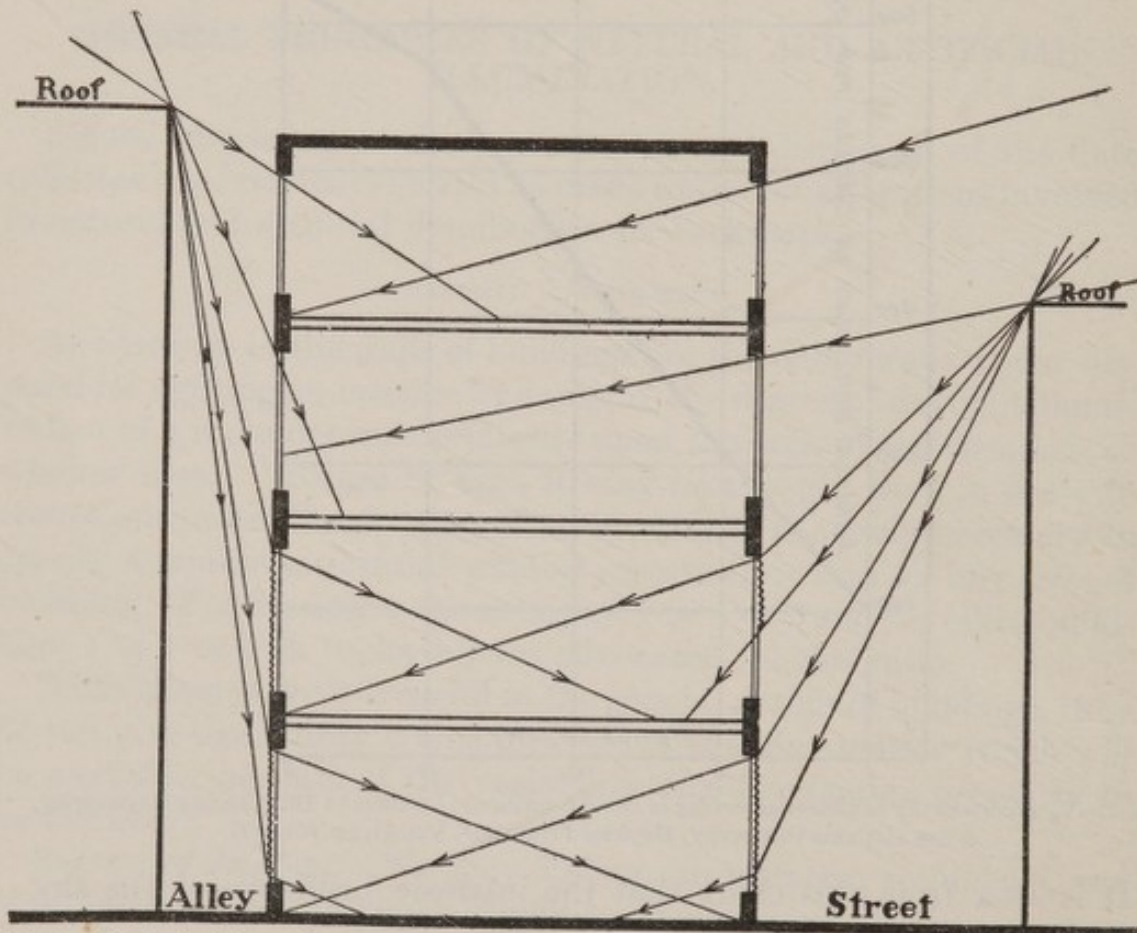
Typical relation of loft buildings in the Women's Garment Industries, New York City, to the sky and adjacent structures.
